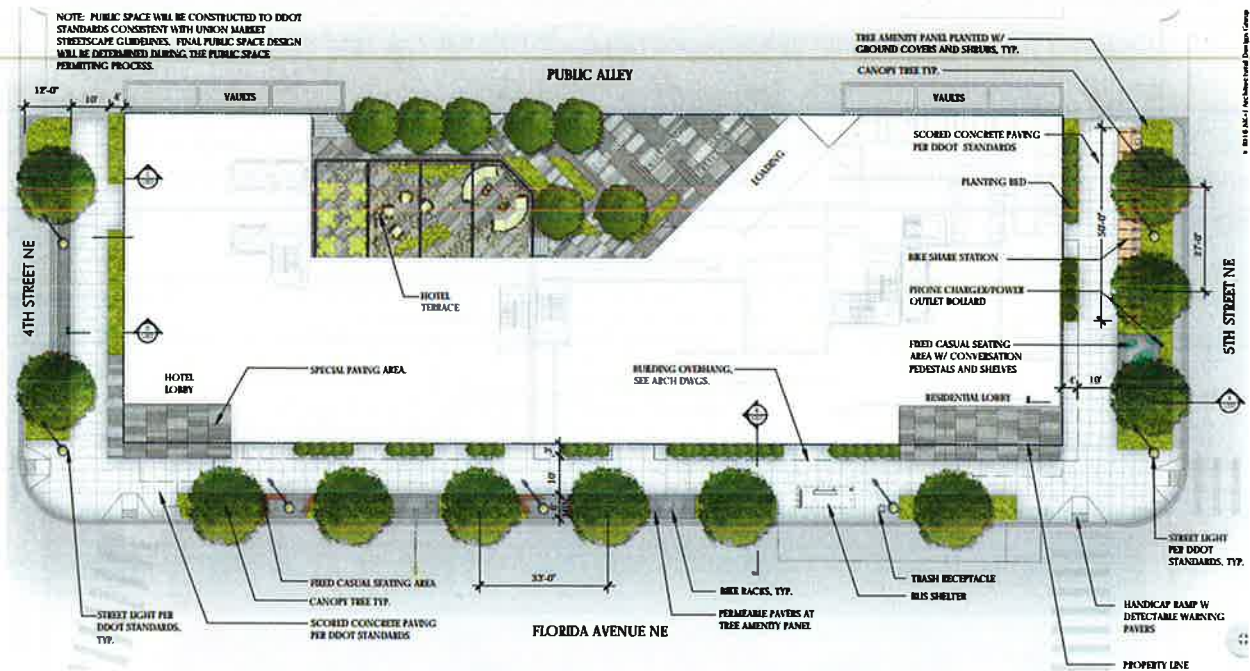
Landscape Plan (Source: SK&I Architecture 10/7/16)
